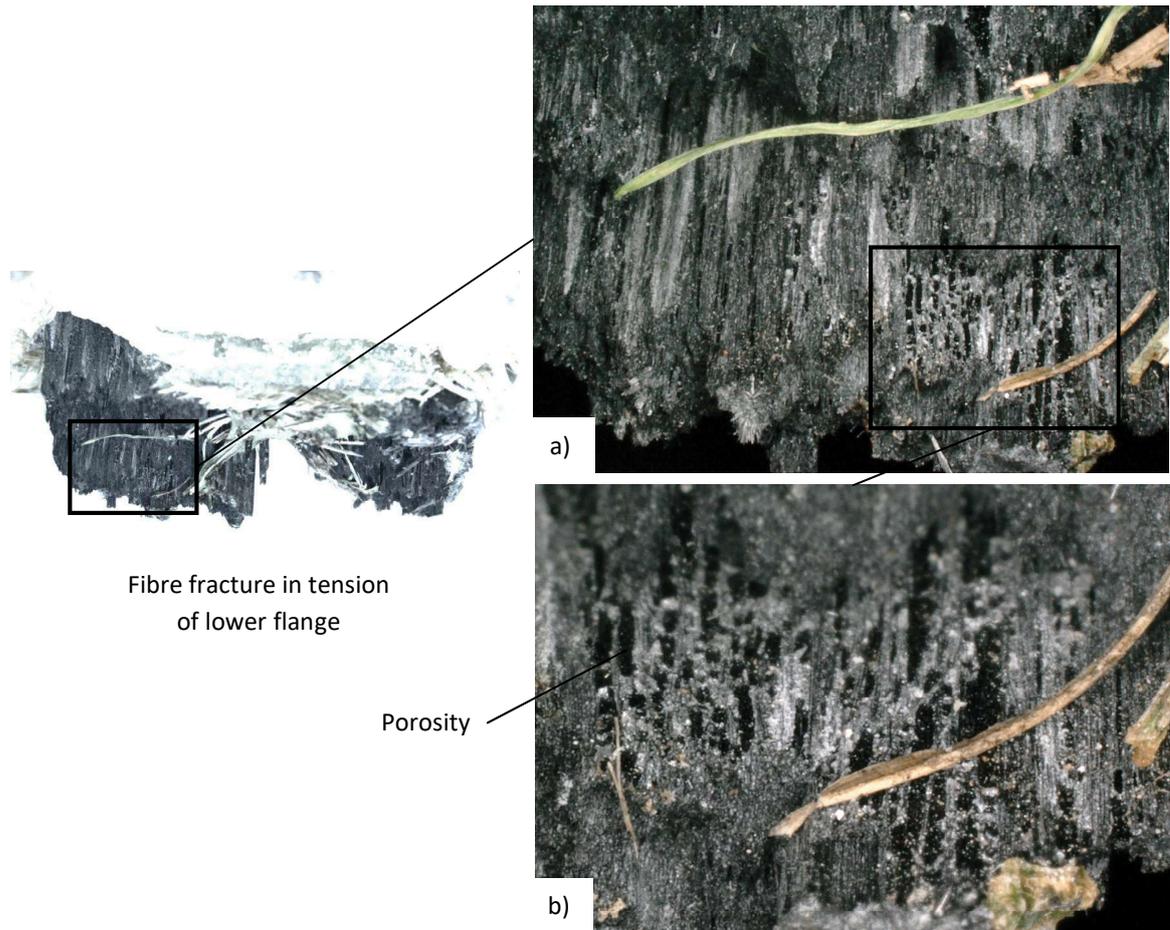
Overview and details of the internal fracture surface of the lower flange with observed porosity.
